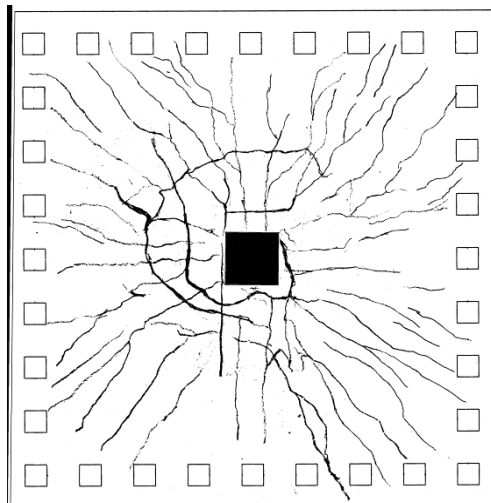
Failure surfaces and crack patterns of specimen R1-A
